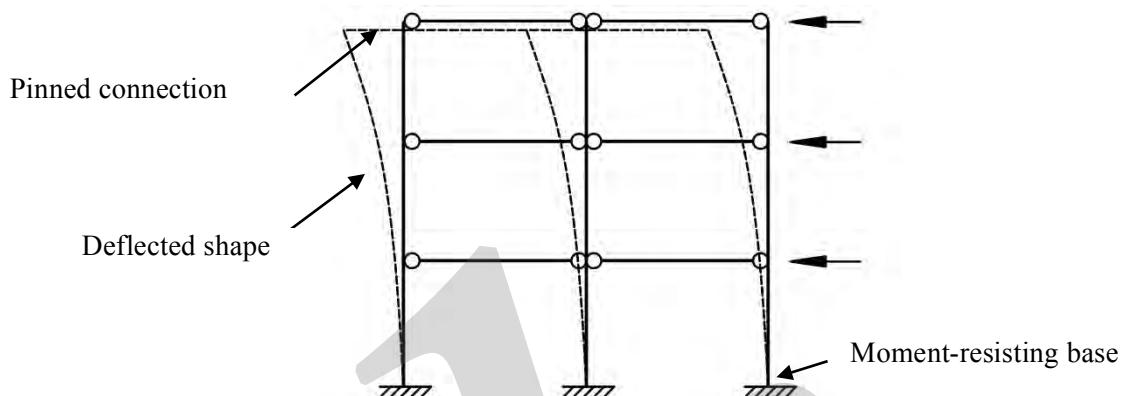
Schematic deflections in an unbraced (sway) frame using cantilever action in columns
